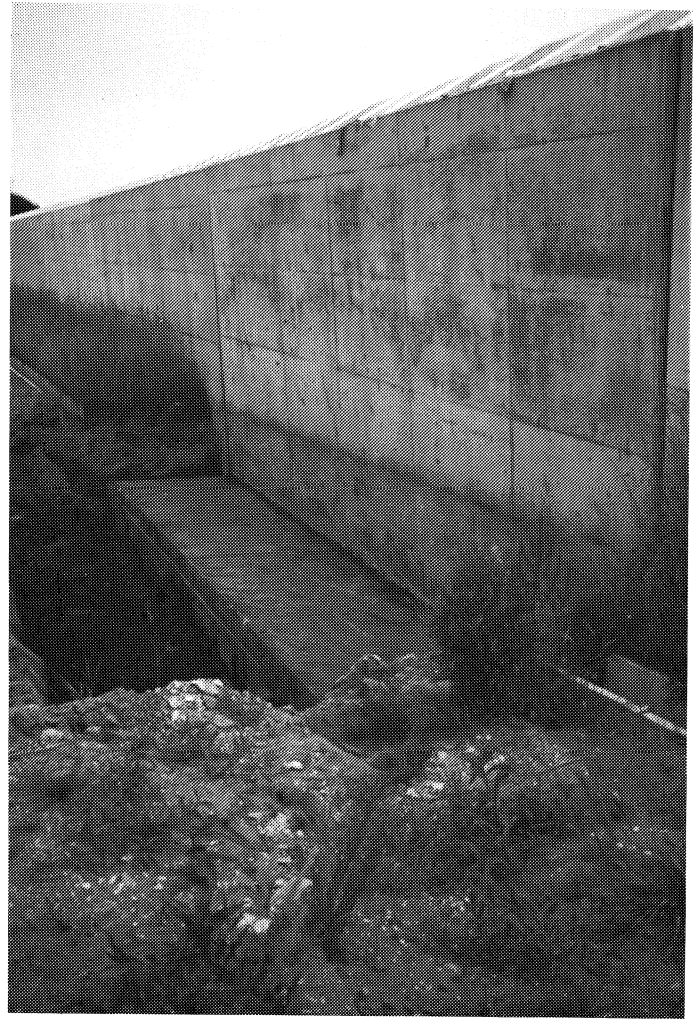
Failed east side of the snowshed. Lateral spreading of the fill and/or liquefaction caused spreading of the footings, rotation of the stem wall, and failure of the stem wall.
